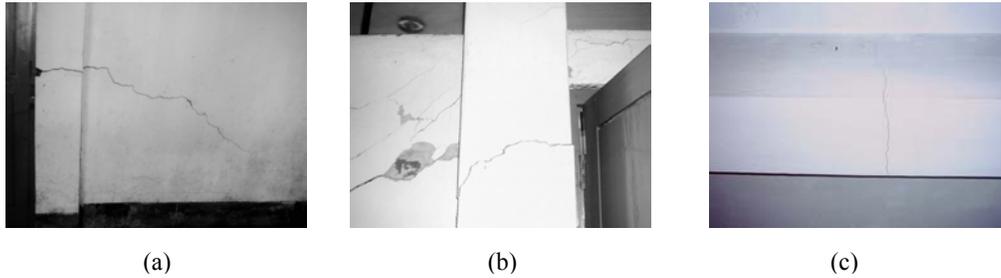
Patterns of damages of structural elements (a) Typical wall (b) Typical column (c) Typical beam
